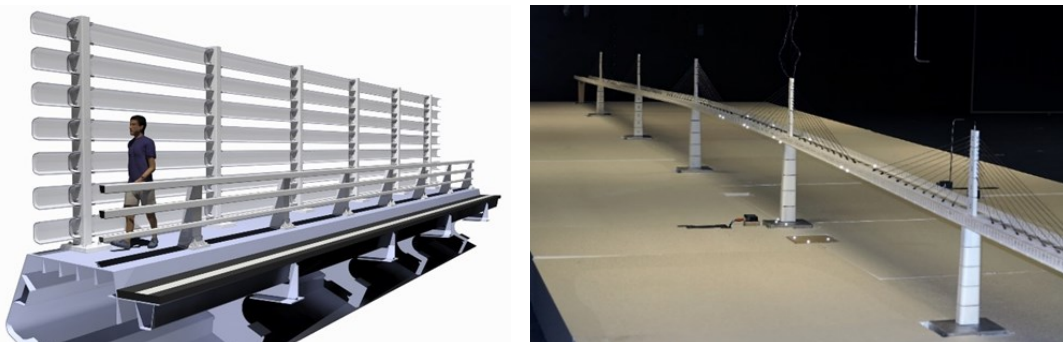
Concept of wind barrier and Full bridge model test, scale 1:150
